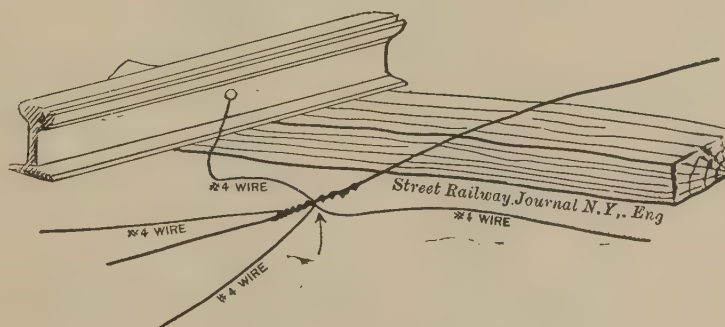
SOLDER CONNECTIONS FOR RETURN WIRE.
